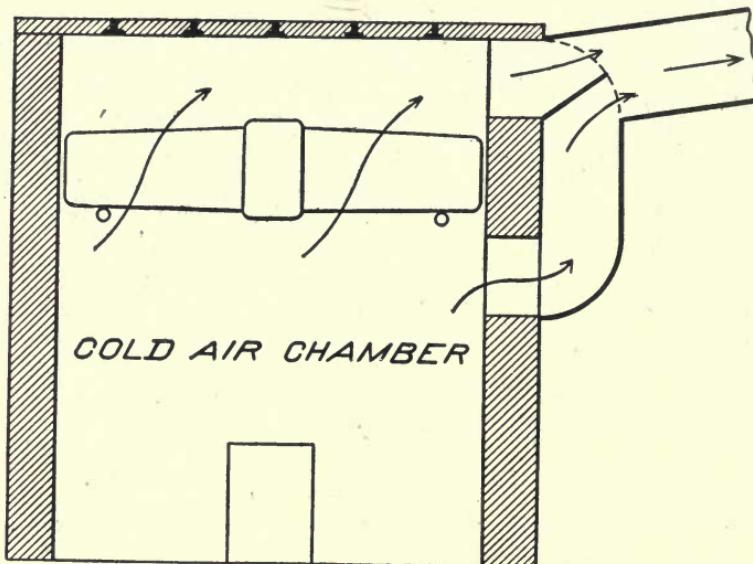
Heater and Mixing Damper with Brick Casing. Damper between Heater and Register.
